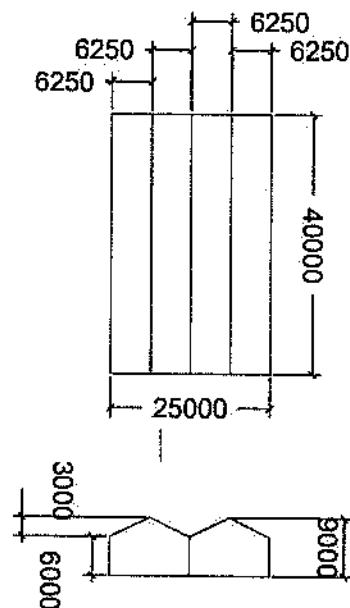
Plan and typical elevation for riggers workshop (BLDG 649)
